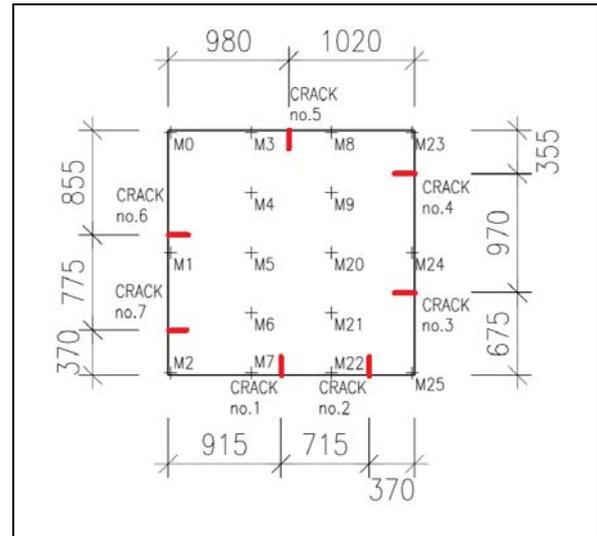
FIGURE VII. SCHEMATIC PLAN OF MAJOR CRACK DISTRIBUTION.
